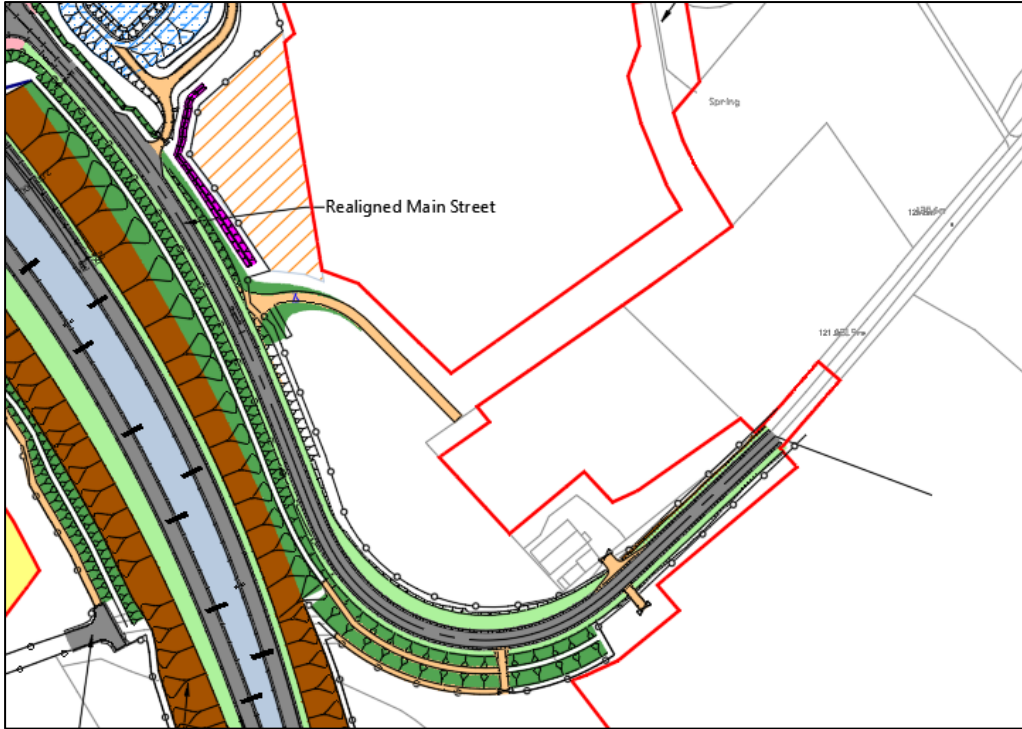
(b) Extract from General Arrangement Drawing (After)
